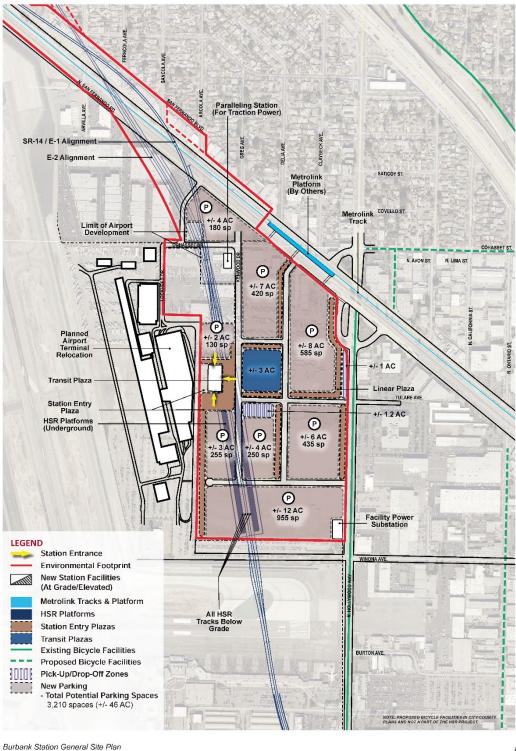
B-6 Palmdale to Burbank Project Section Build Alternatives and Station
